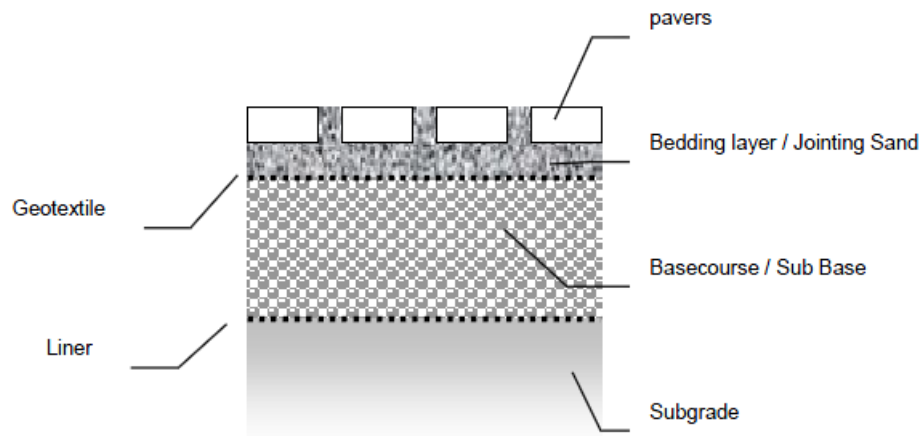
8 - Typical permeable paving cross-section (URS New Zealand Ltd., 2004).
